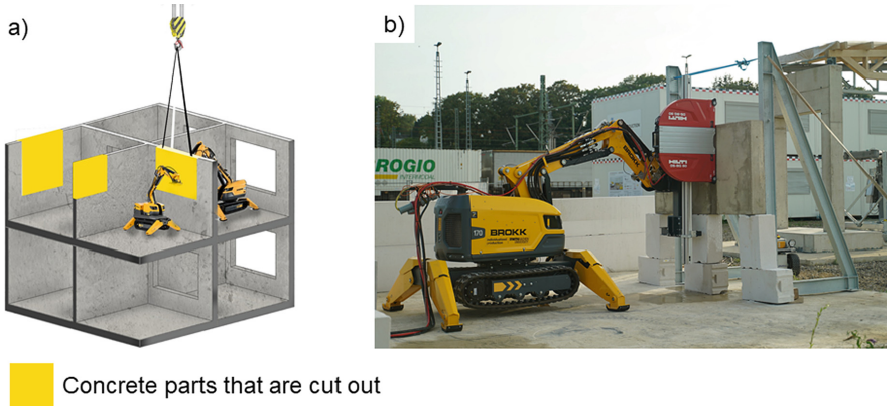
a) sketch to demonstrate cutting process in buildings, b) real set up of deconstruction machine and saw
